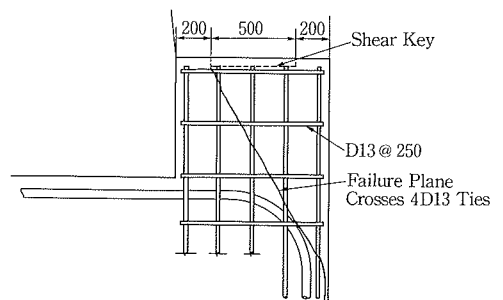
(b) A Shear Crack along Bent Down Rebar in The Joint (Ref. 9)
